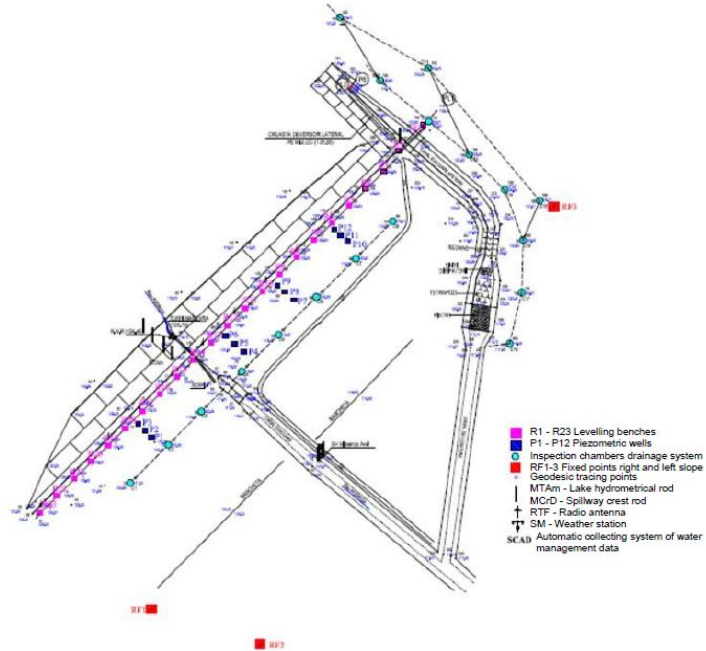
Disposal of piezometric wells on Mileanca dam.
